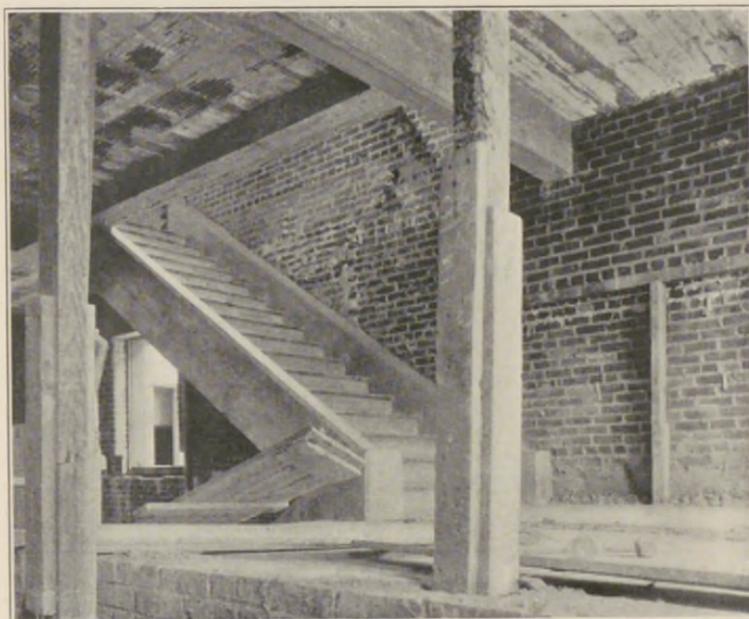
Concrete wall-bearing construction. Type 136, Philadelphia public schools.
